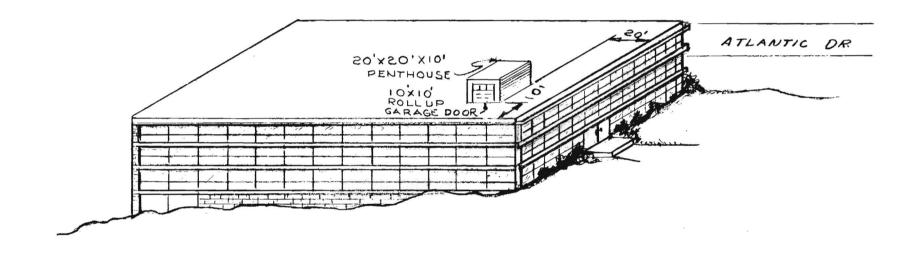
Requested Transmitting Site Atop the Proposed Electrical Engineering Building.
